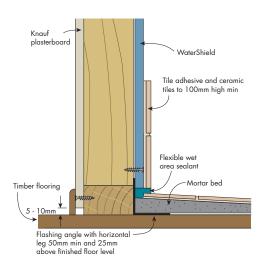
Wall Base in Wet Areas (Outside Shower) With flashing angle
